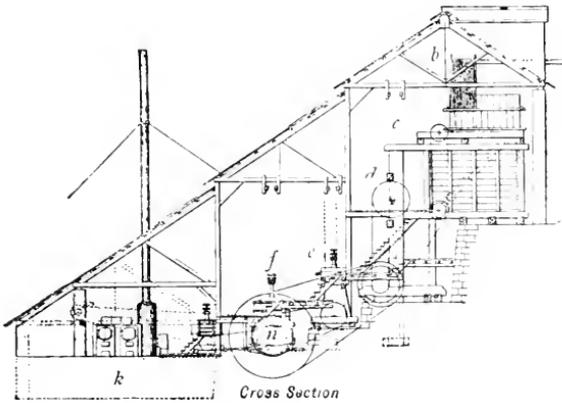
SECTION OF A 30-STAMP SILVER MILL, BOSS CONTINUOUS PROCESS.
